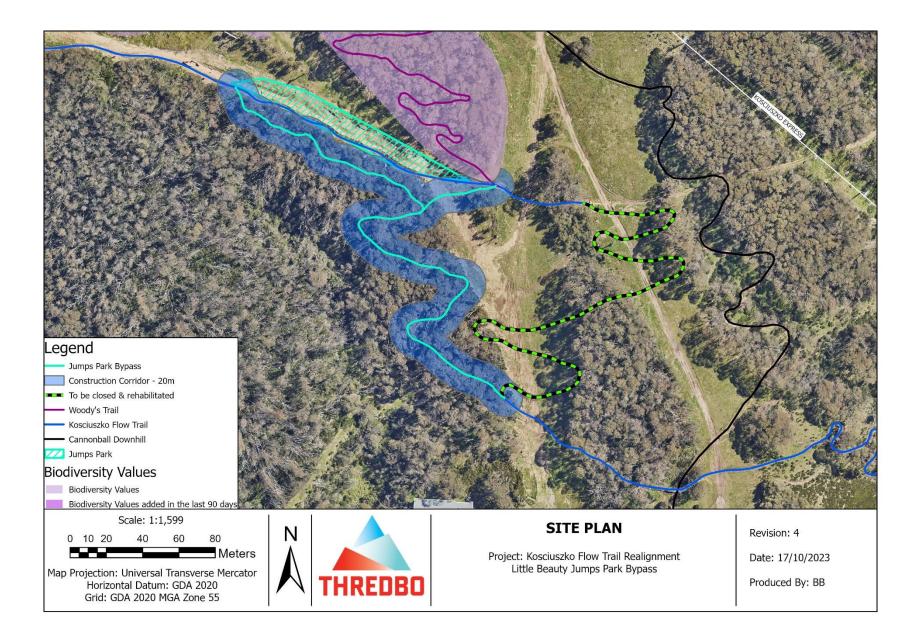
Flow Trail Realignment and Little Beauty Jumps Park Bypass Site Plan.
